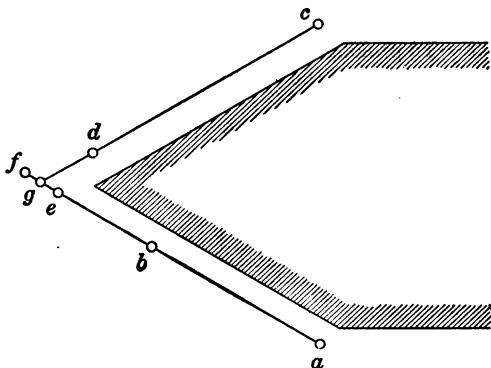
ANGLE BETWEEN WALLS OF BUILDING.
